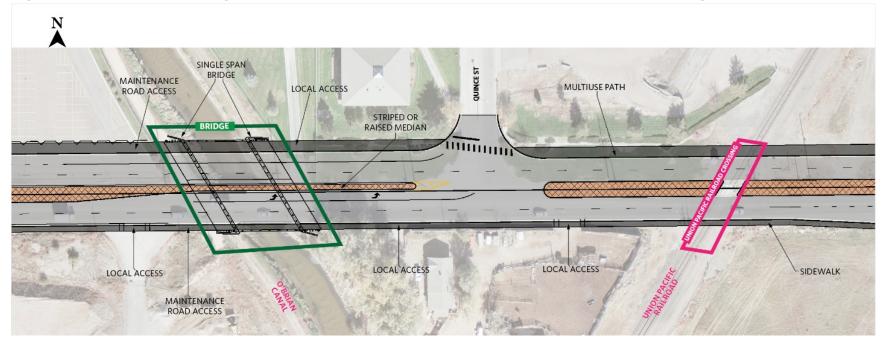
E. 88th Avenue Bridge Replacement, Improvements at Quince Street, and UPRR Crossing
